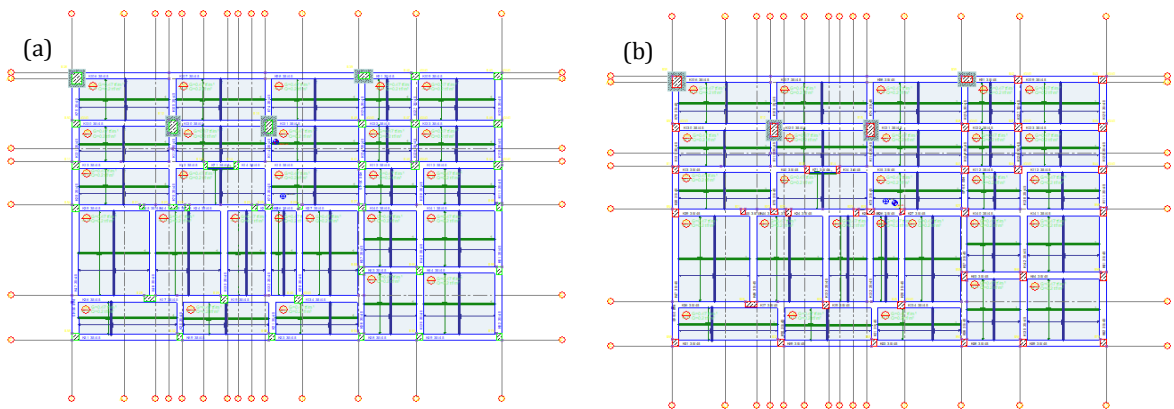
Structure plan after reinforcement: (a) Ground floor; (b) 1<sup>st</sup> floor.
